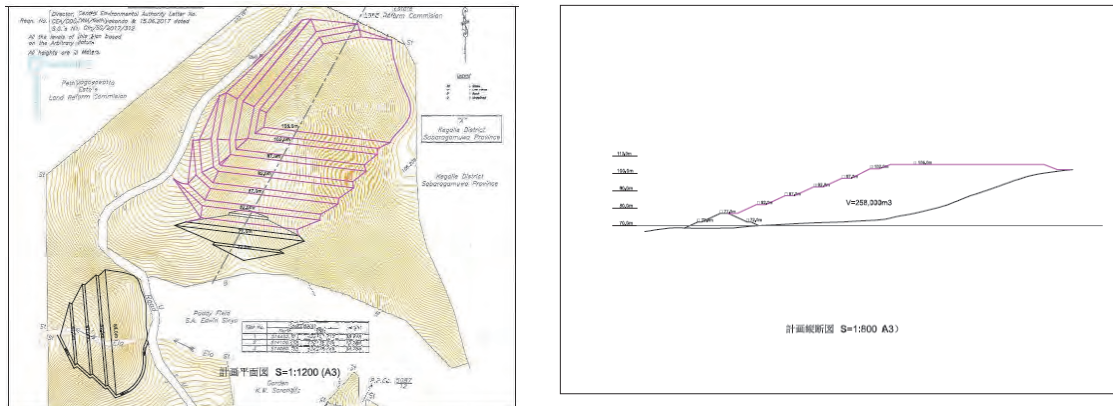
The plan and cross section of sanitary landfill site at Athuthanagalla in Gampaha district
